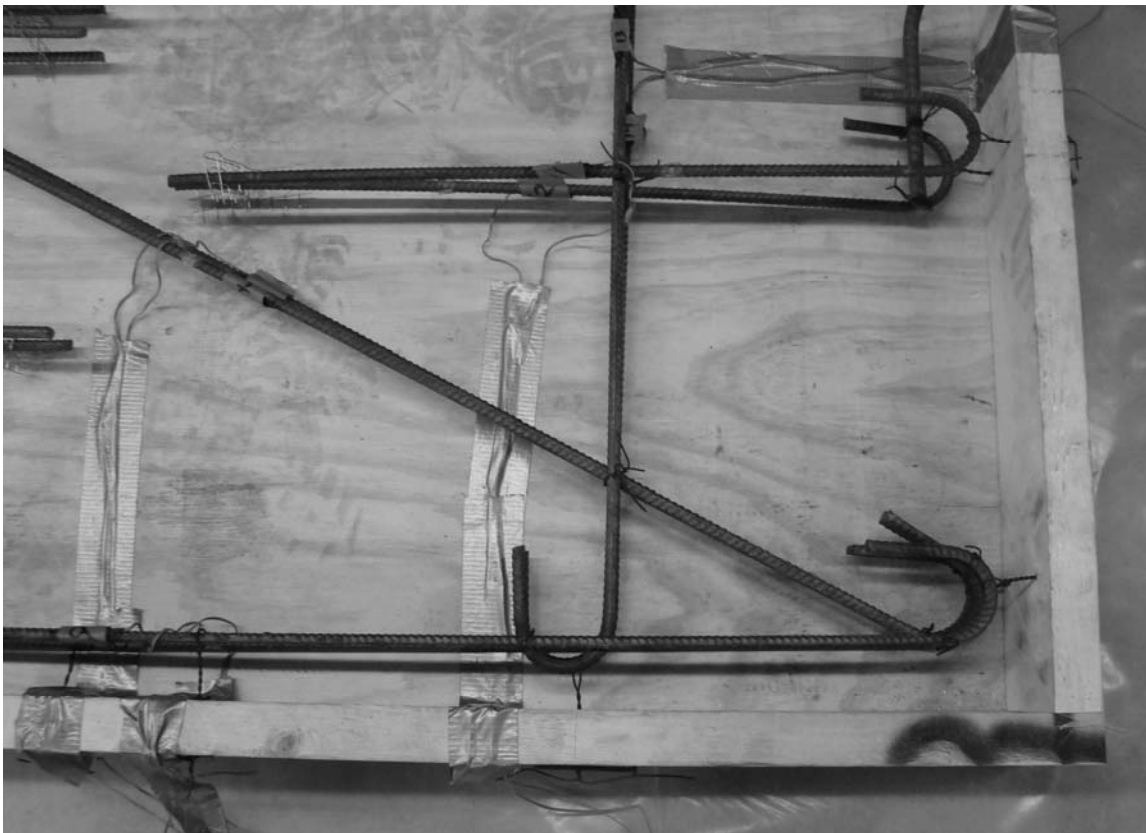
Reinforcing steel detail at right support. Note strain gages bonded to steel bars
